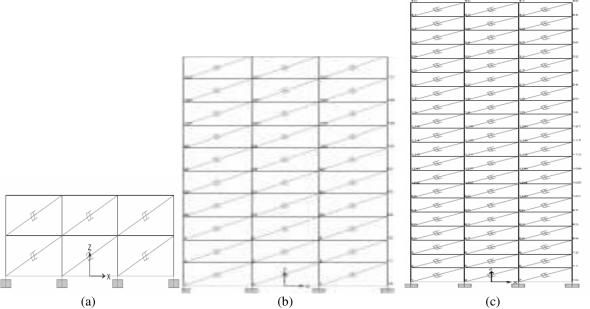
(a) Arrangement of dampers in two storey frame (b) Arrangement of dampers in ten storey frame (c) Arrangement of dampers in twenty storey frame
